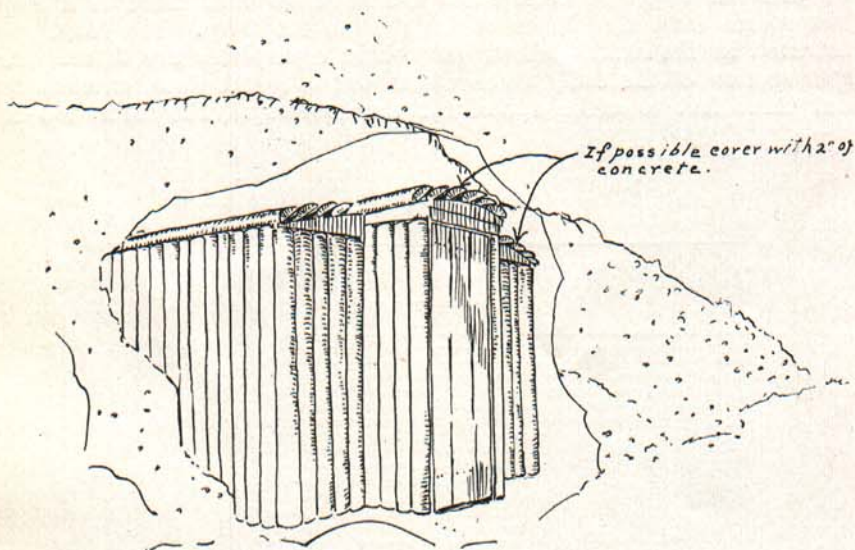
(A)—A root cellar dug into side hill, made by standing three to five inch poles on end, using split poles for roof and covering with dirt. If possible, the roof should be covered with two inches of concrete, to make it water proof.
